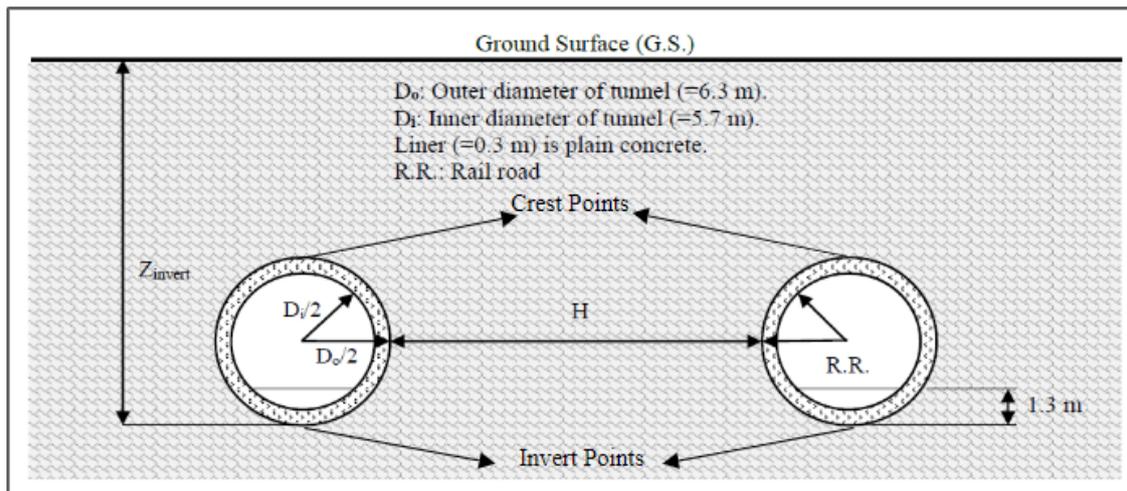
Cross section of the proposed Baghdad Metro Tunnel (Baghdad Mayorality)
